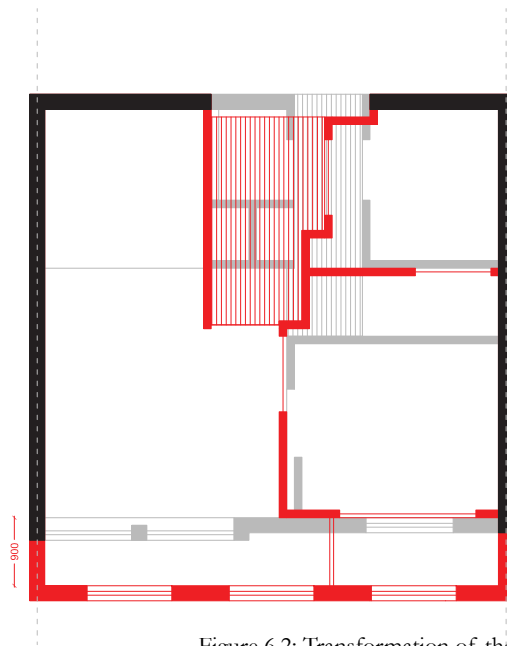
Transformation of the 1b1p-flat floor plan (scale 1:100)
